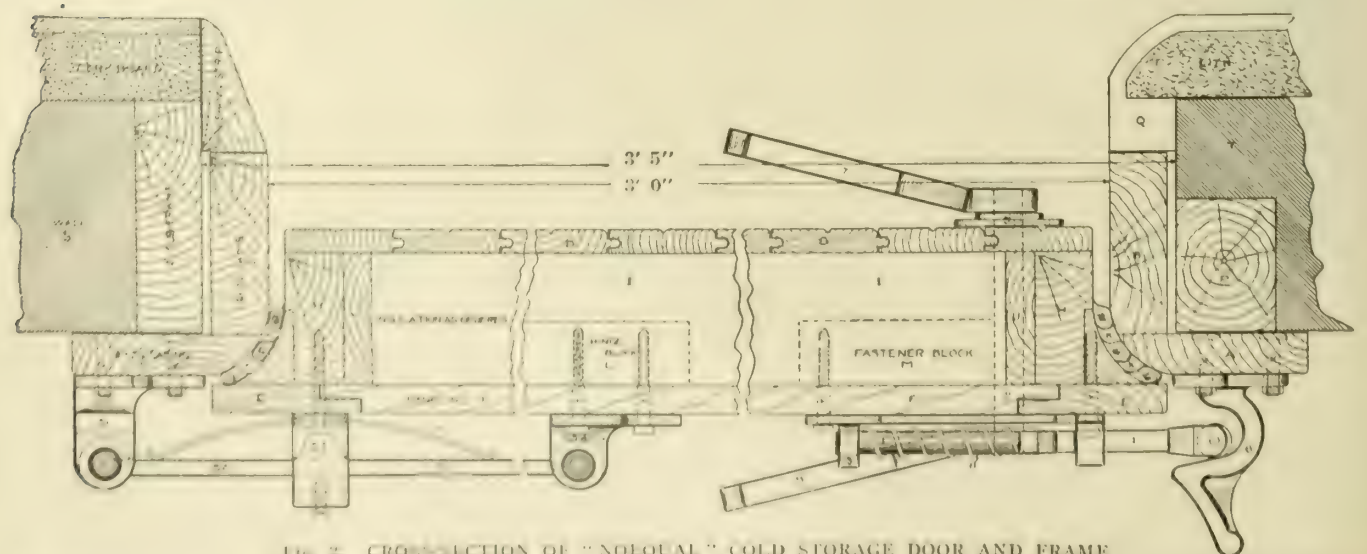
CROSS-SECTION OF "NOEQUAL" COLD STORAGE DOOR AND FRAME
